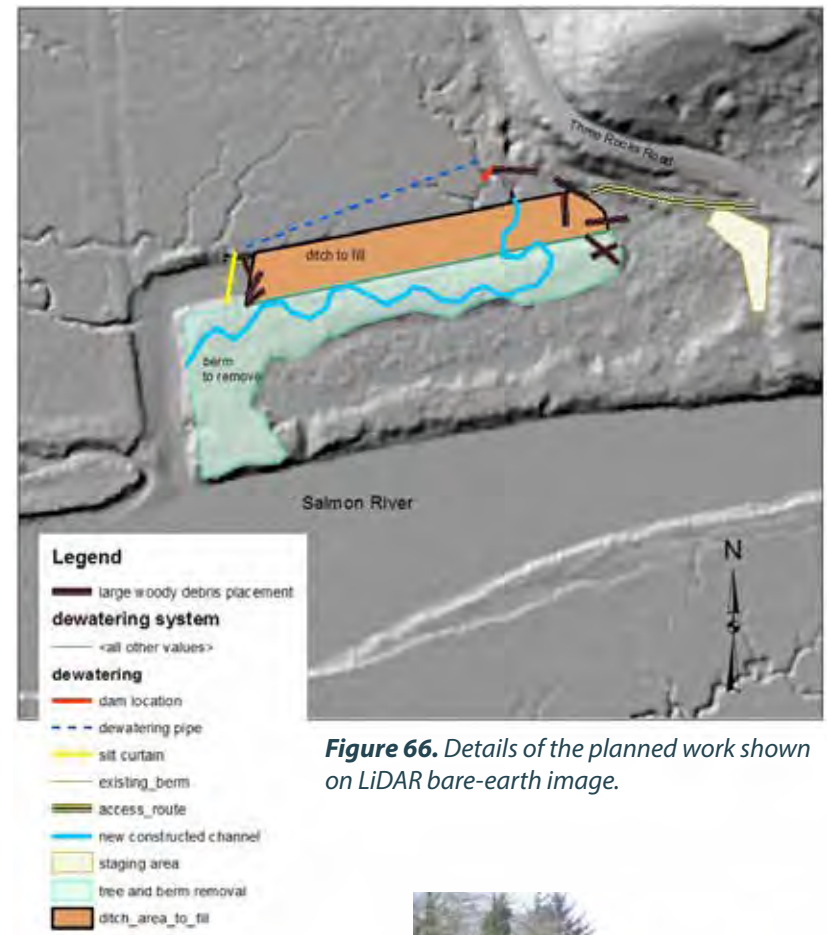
Details of the planned work shown on LiDAR bare-earth image.
